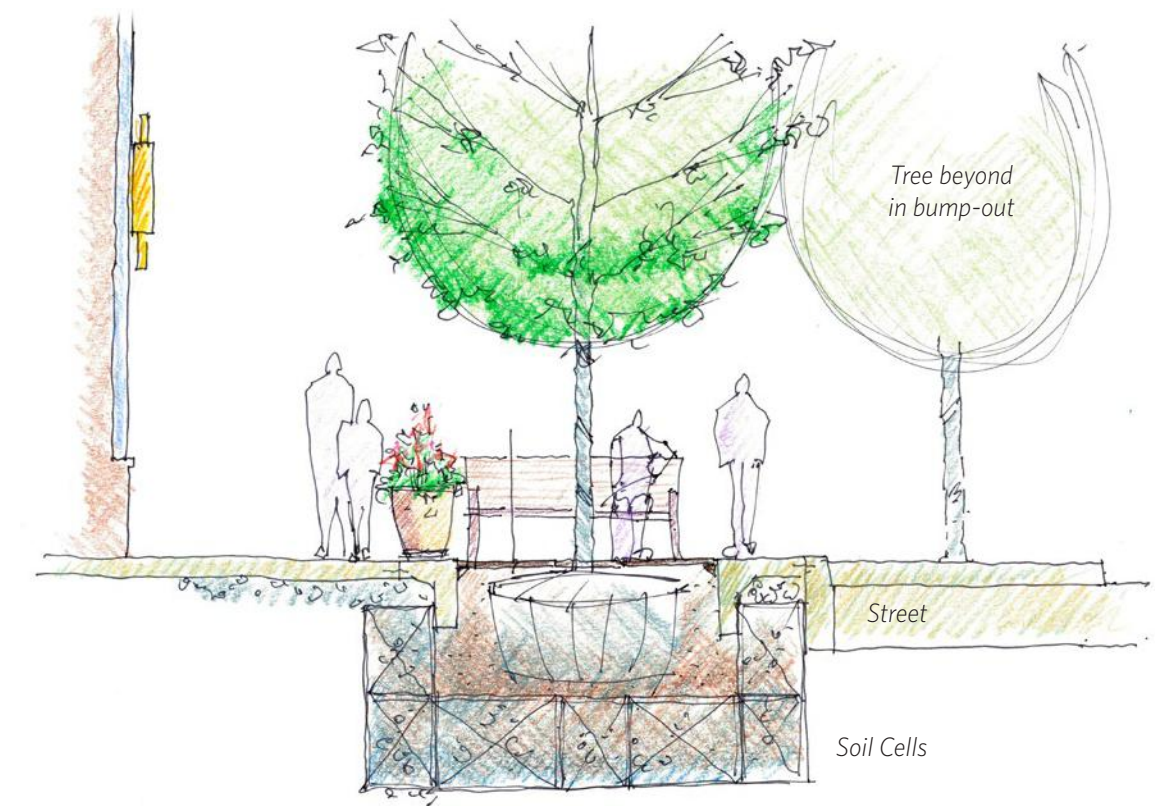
Street Tree Planting Details with Structural Sidewalk — Section
